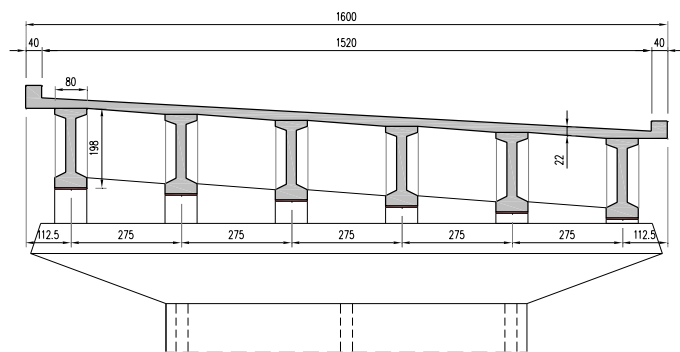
Cross section of the deck / Sezione trasversale dell'impalcato.
